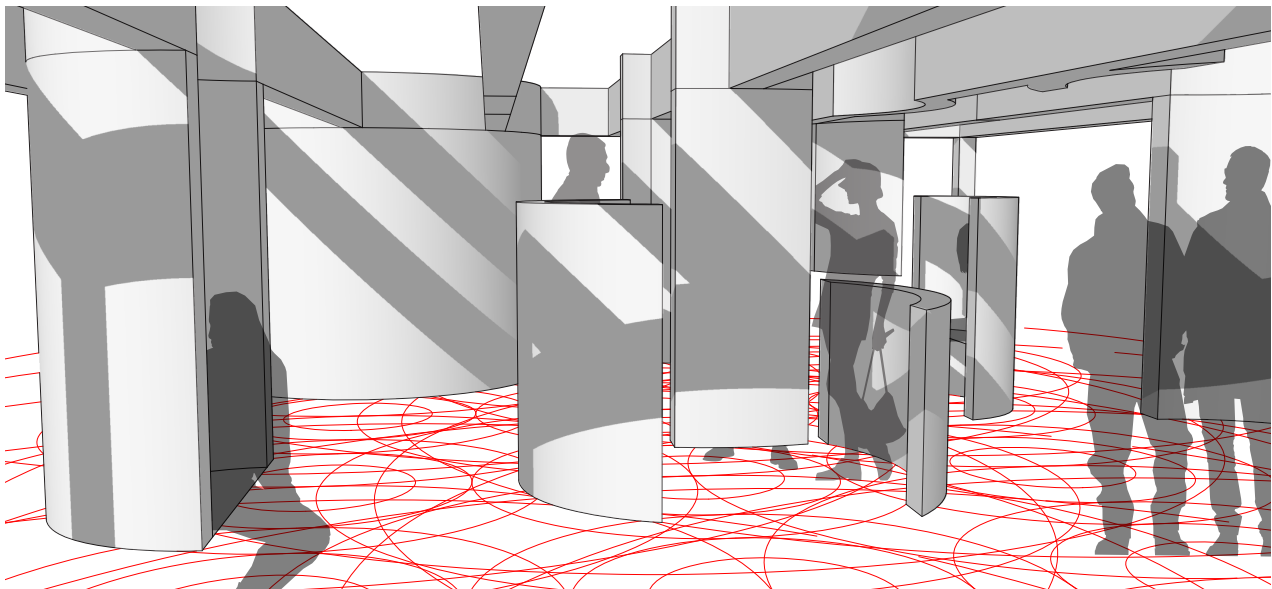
Perspective showing how the rooms are defined by structures in the floor and by the beams in the roof
